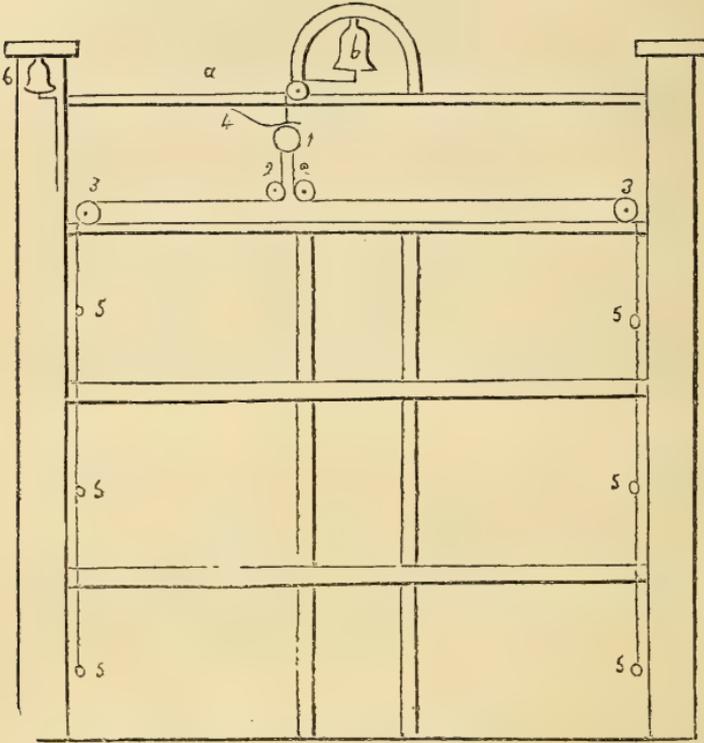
Section of a House fitted with an Alarm Bell.
